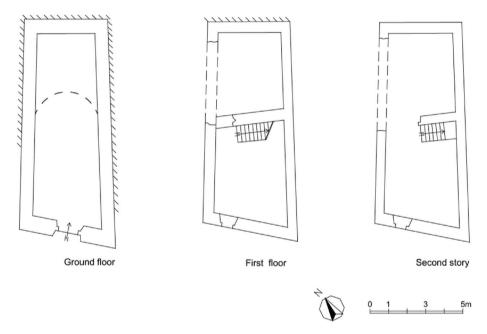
Plans of the analysed historic masonry building in Campi Alto di Norcia (dashed lines for collapsed masonry portions after 1997 earthquake).
